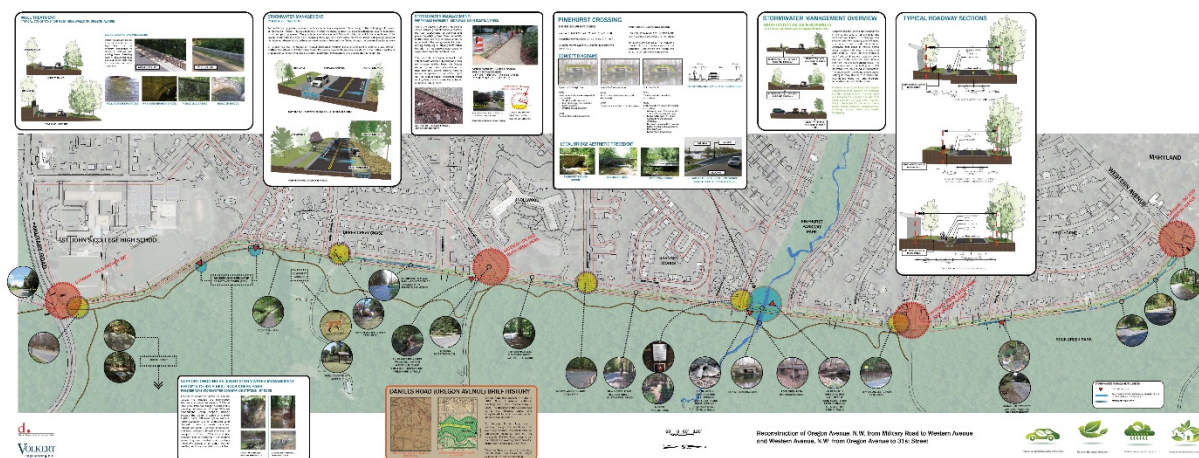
Site Plan presented to the US Commission of Fine Arts.
